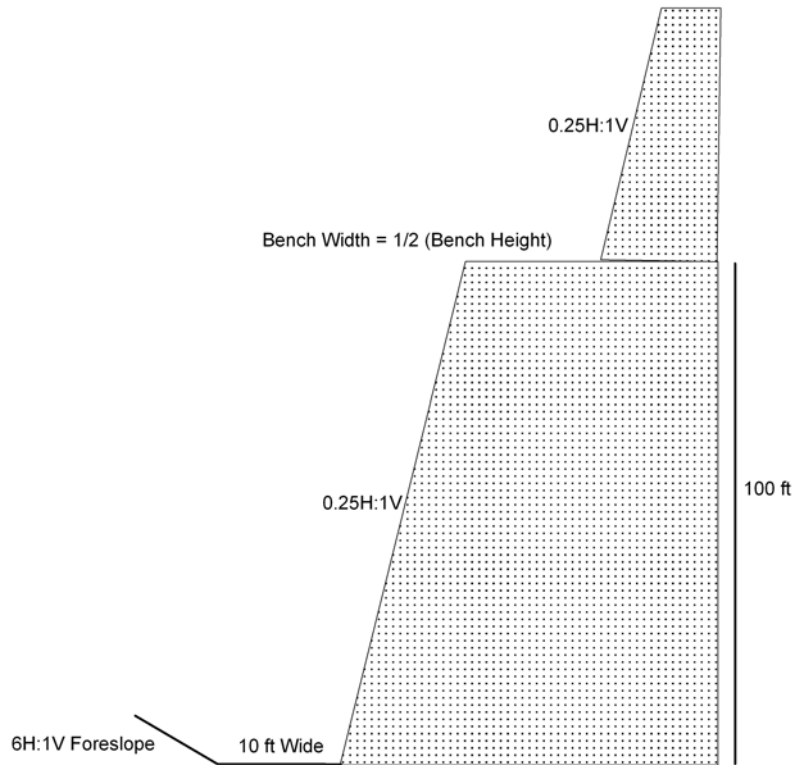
Recommended slope design for competent design units (sandstones only), option 2. The bench height shown in the figure is for situations where a D-50 wall is used as a rockfall barrier.
